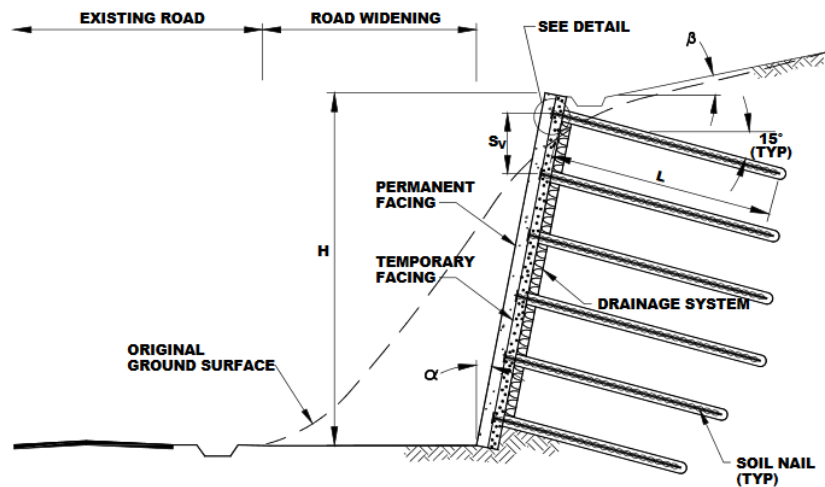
Typical Cross-Section of a Soil Nail Wall.
